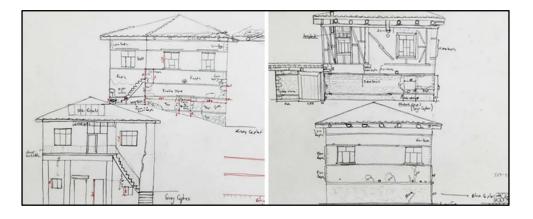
Facade examples from the documentation of nineteen mud brick masonry houses during the site survey in Ağlasun.
